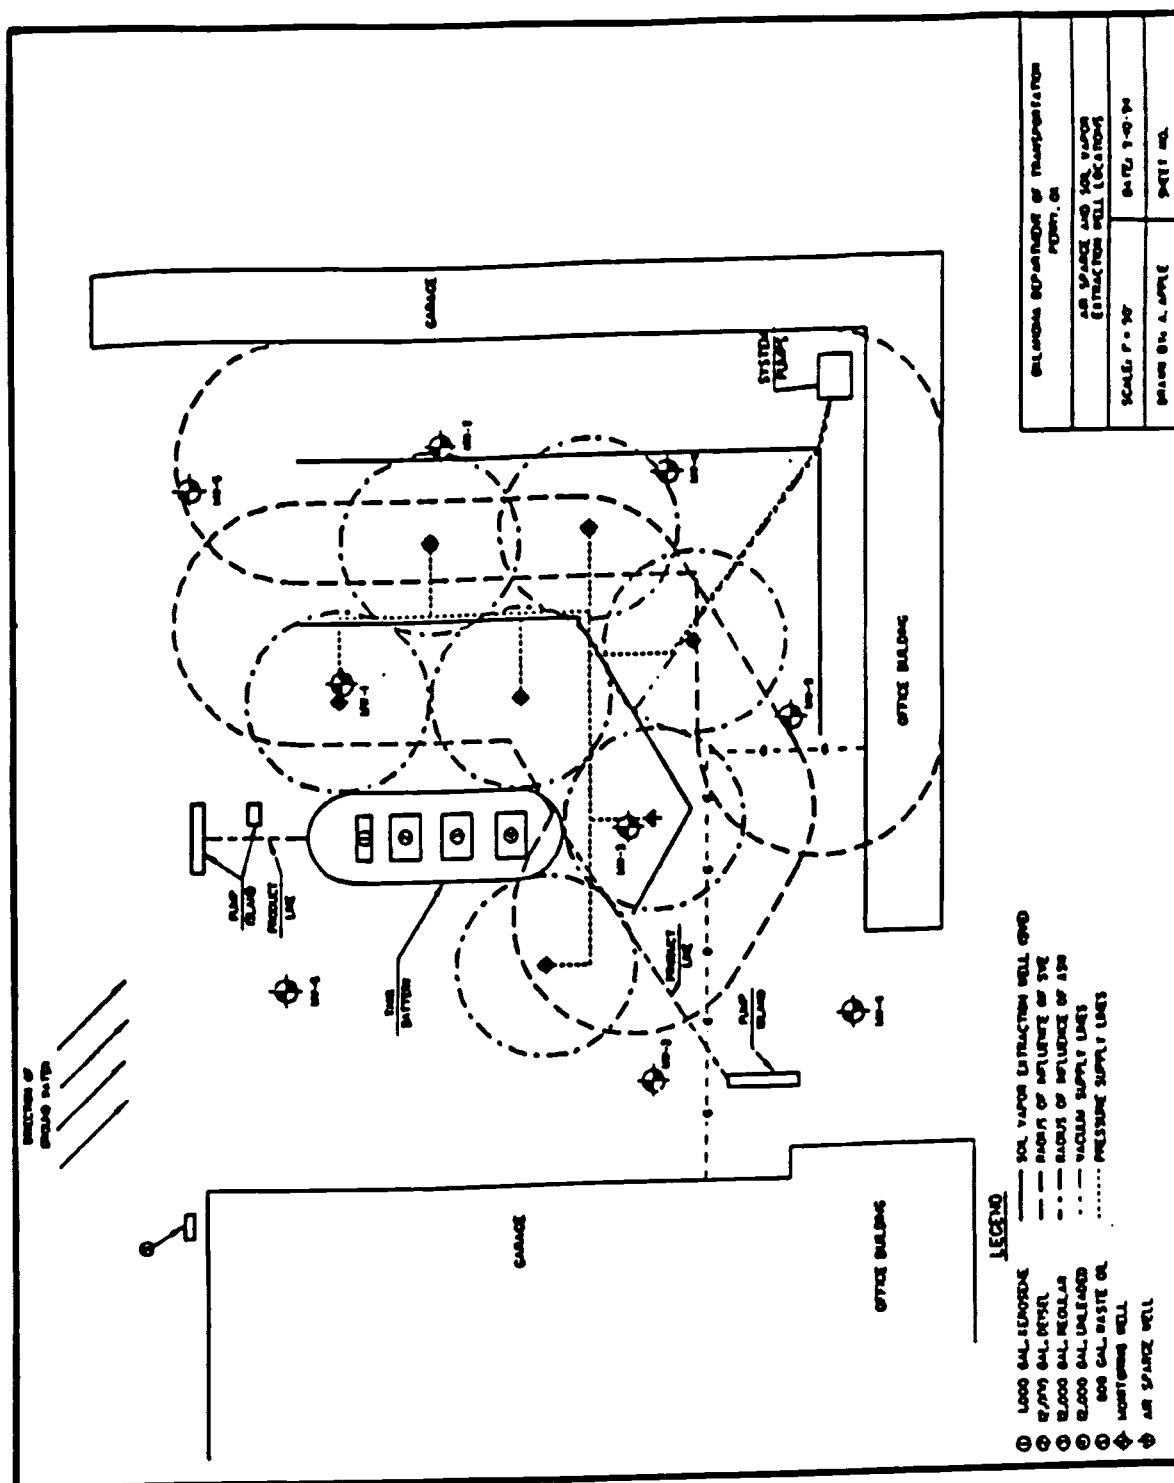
New Air Sparge Well Locations and Vapor Extraction Trench Layout
